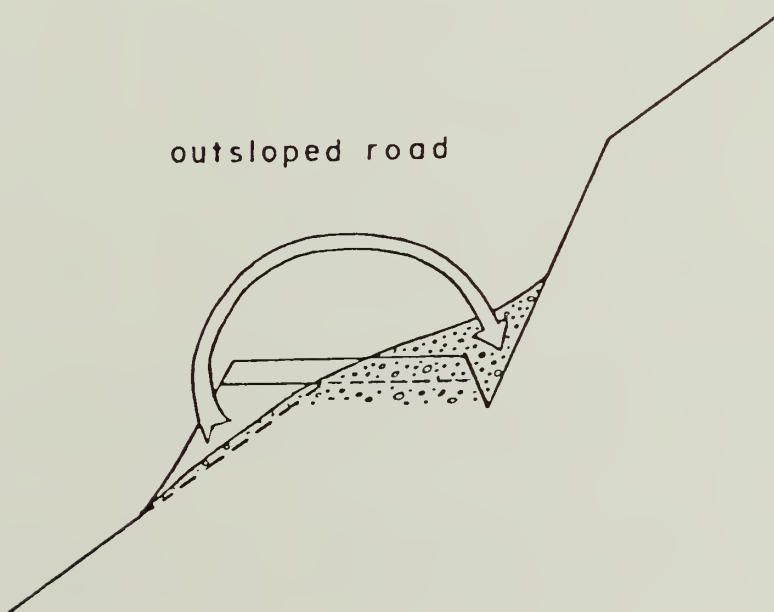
Slope configuration across logging road after heavy equipment transfers fill and grades on outslope.
